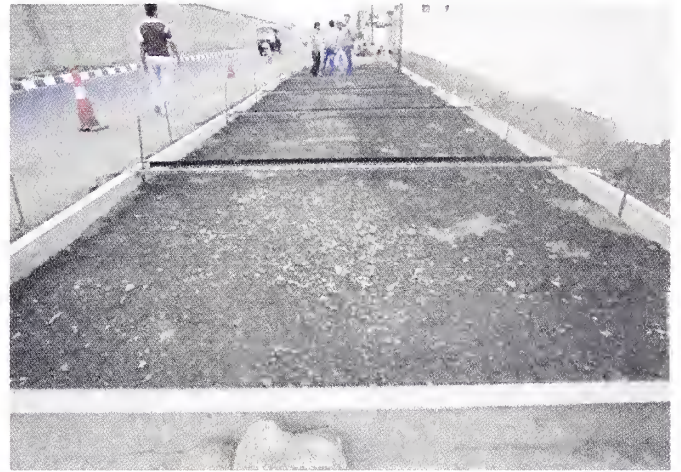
(k) A View of HDPE Separation Strip and Spacer Bar
